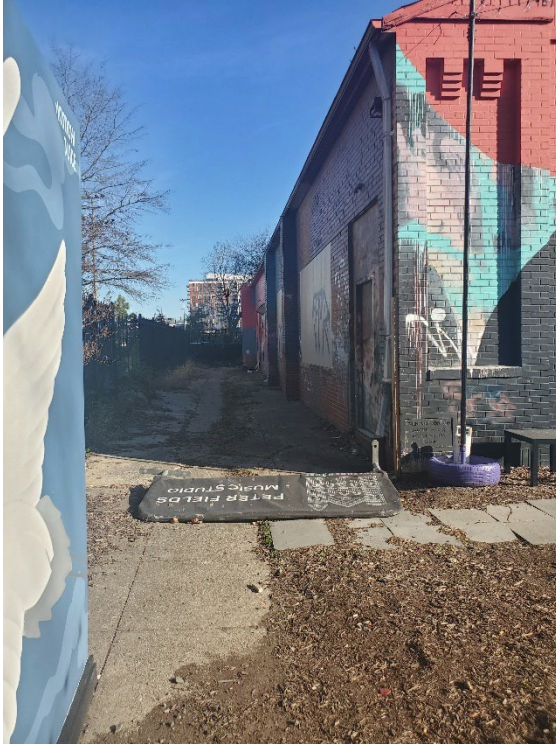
Photo of cracked concrete along north elevation (photo by author)
